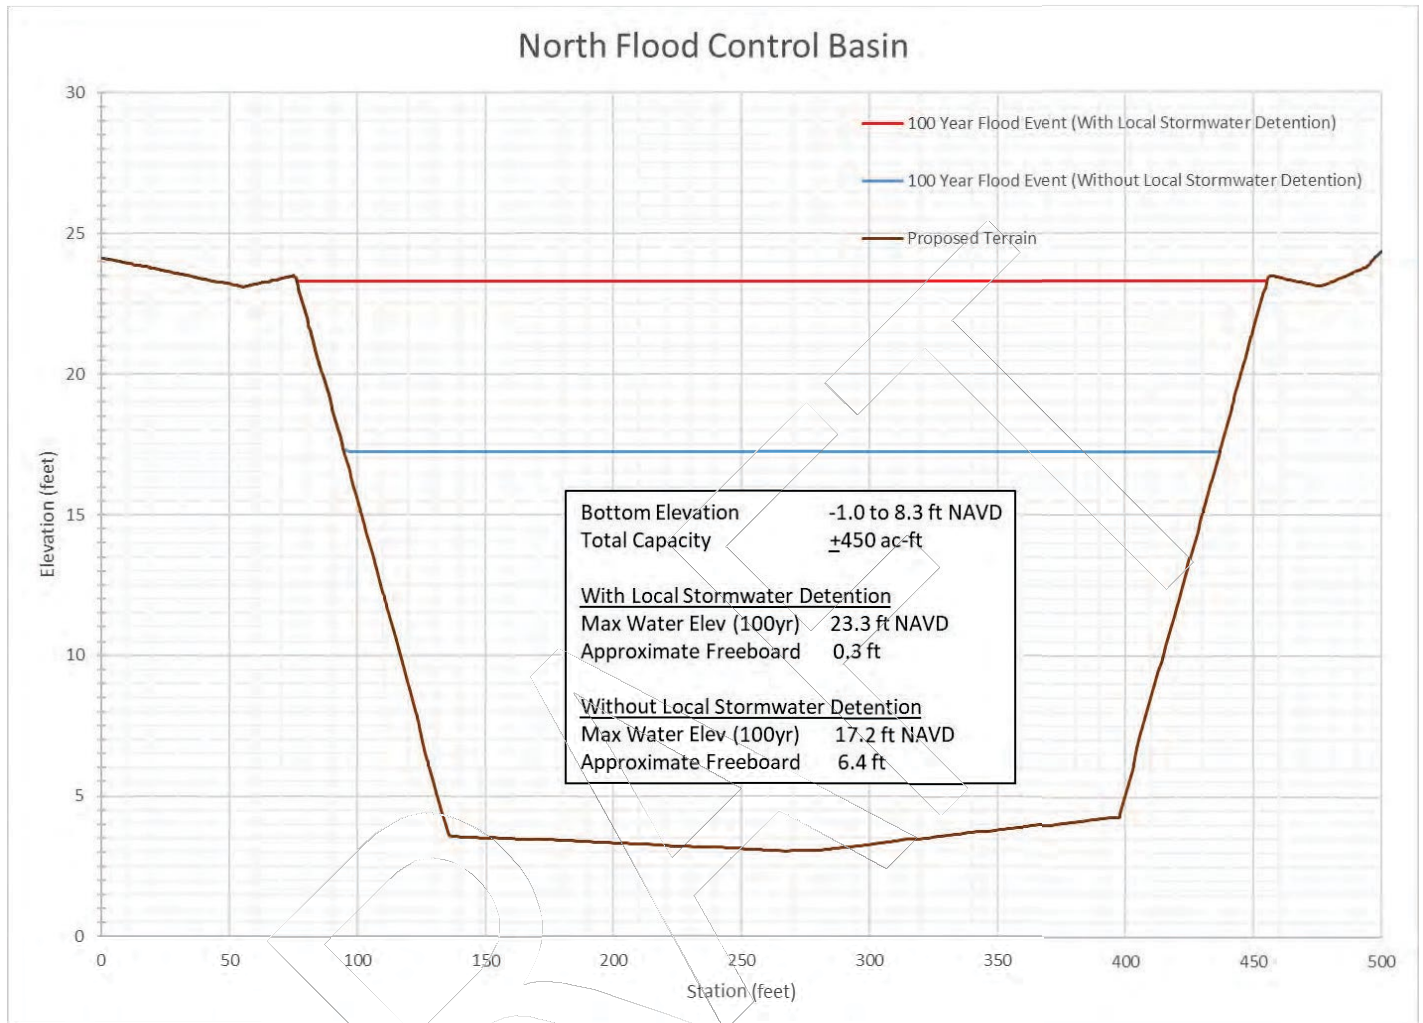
North Flood Control Basin Maximum Water Surface Elevations
